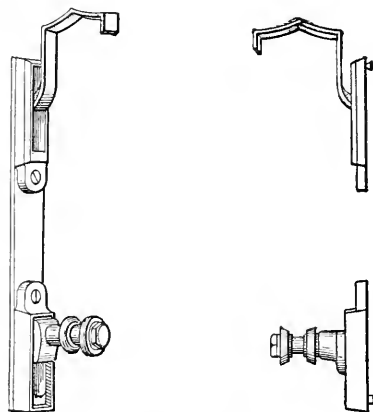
ADJUSTABLE WALL BRACKETS FOR WALL RADIATORS.
